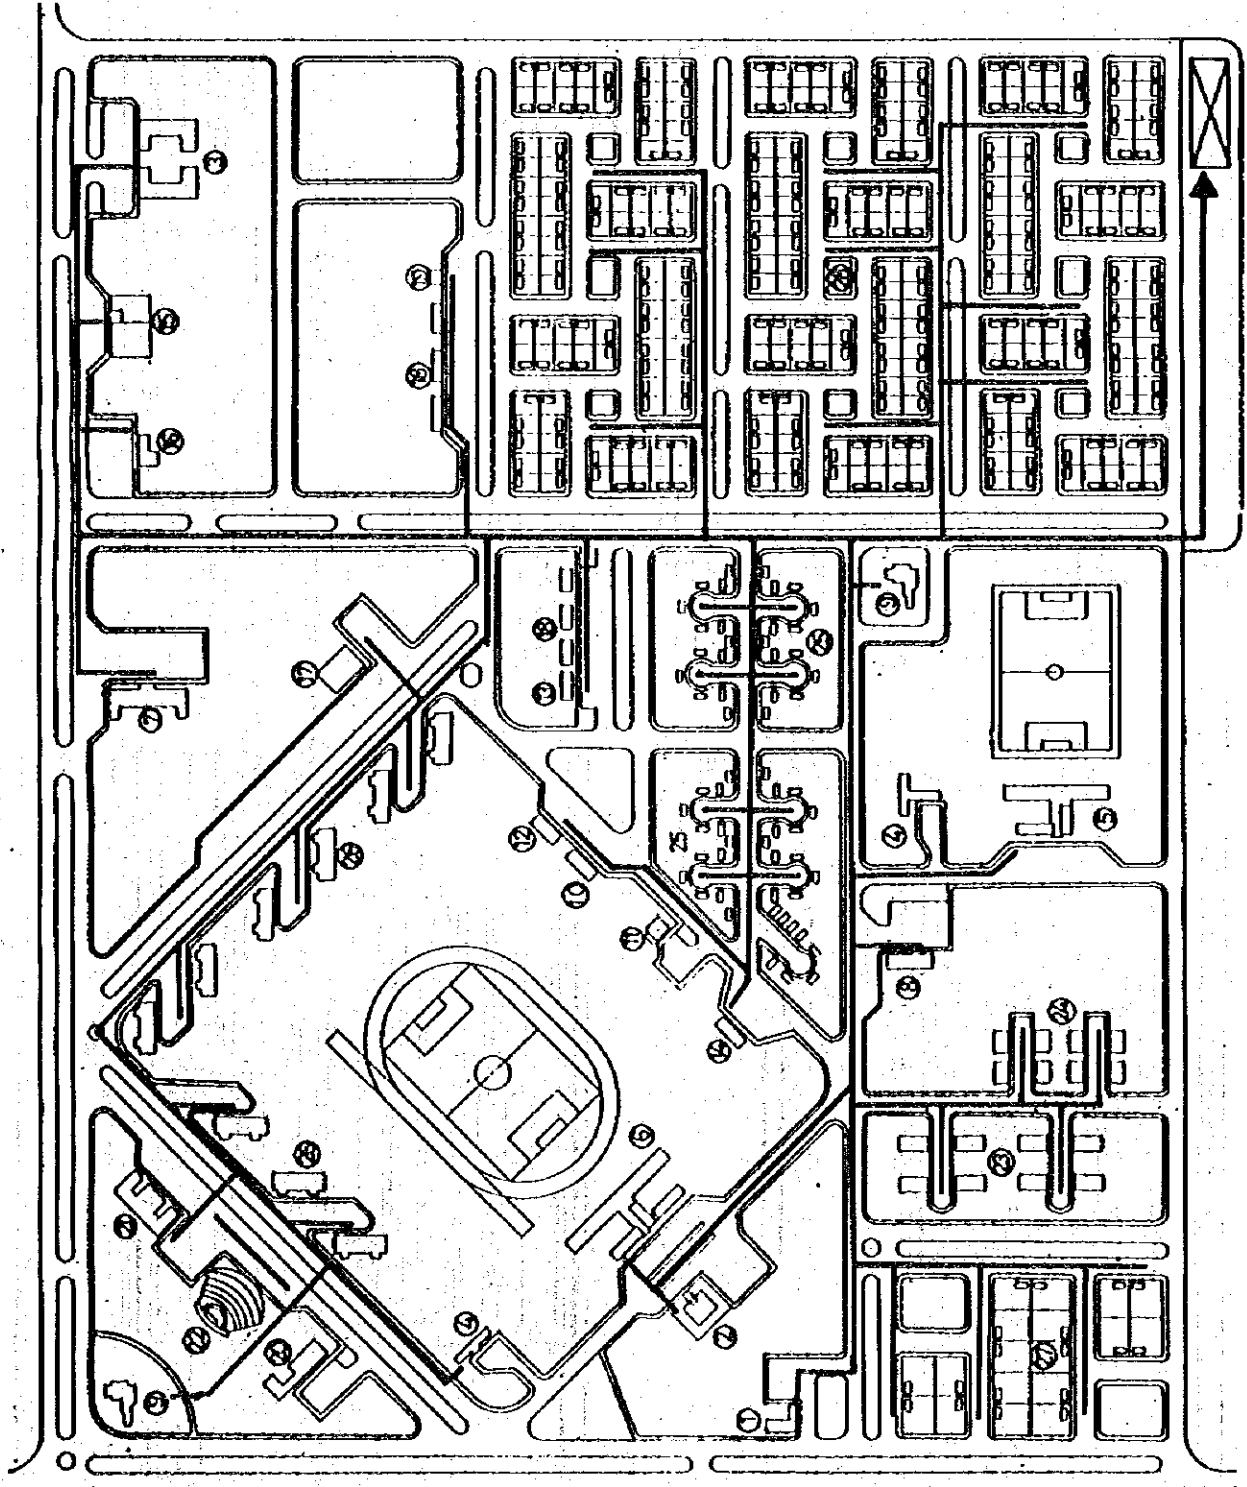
SEWAGE TREATMENT PLAN (2000 PERSINS)
